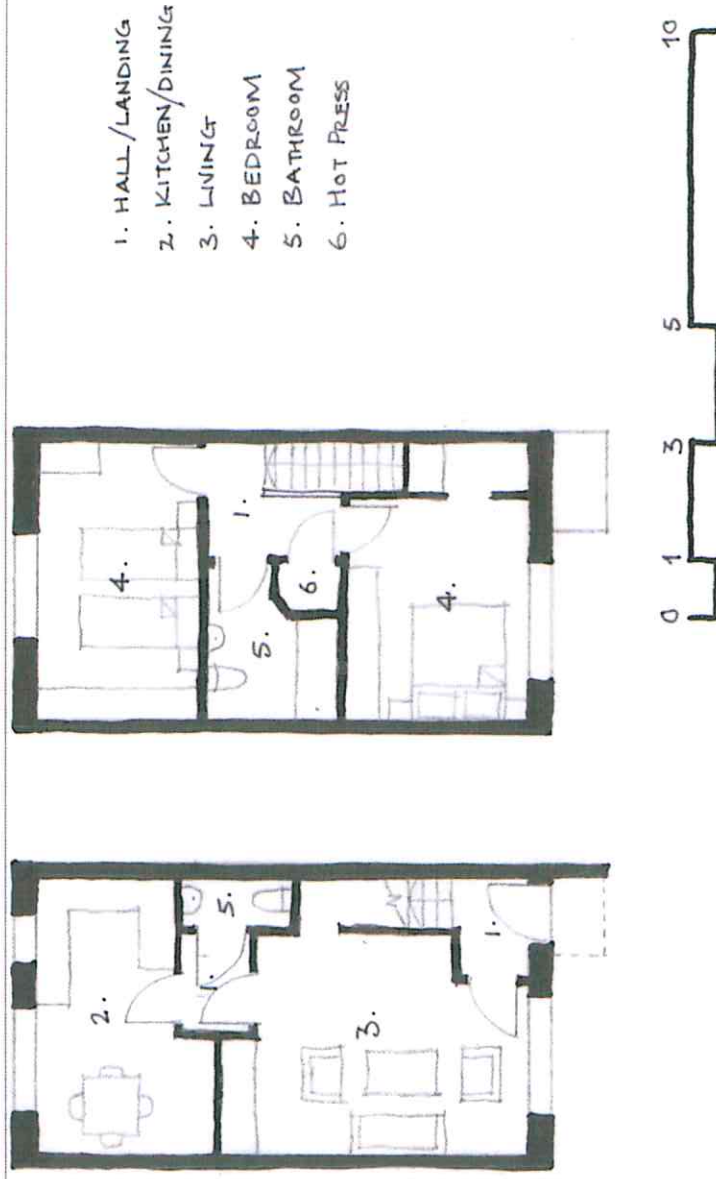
Sketch Plan for Two Bedroom, Four Person House (Two Storey).
